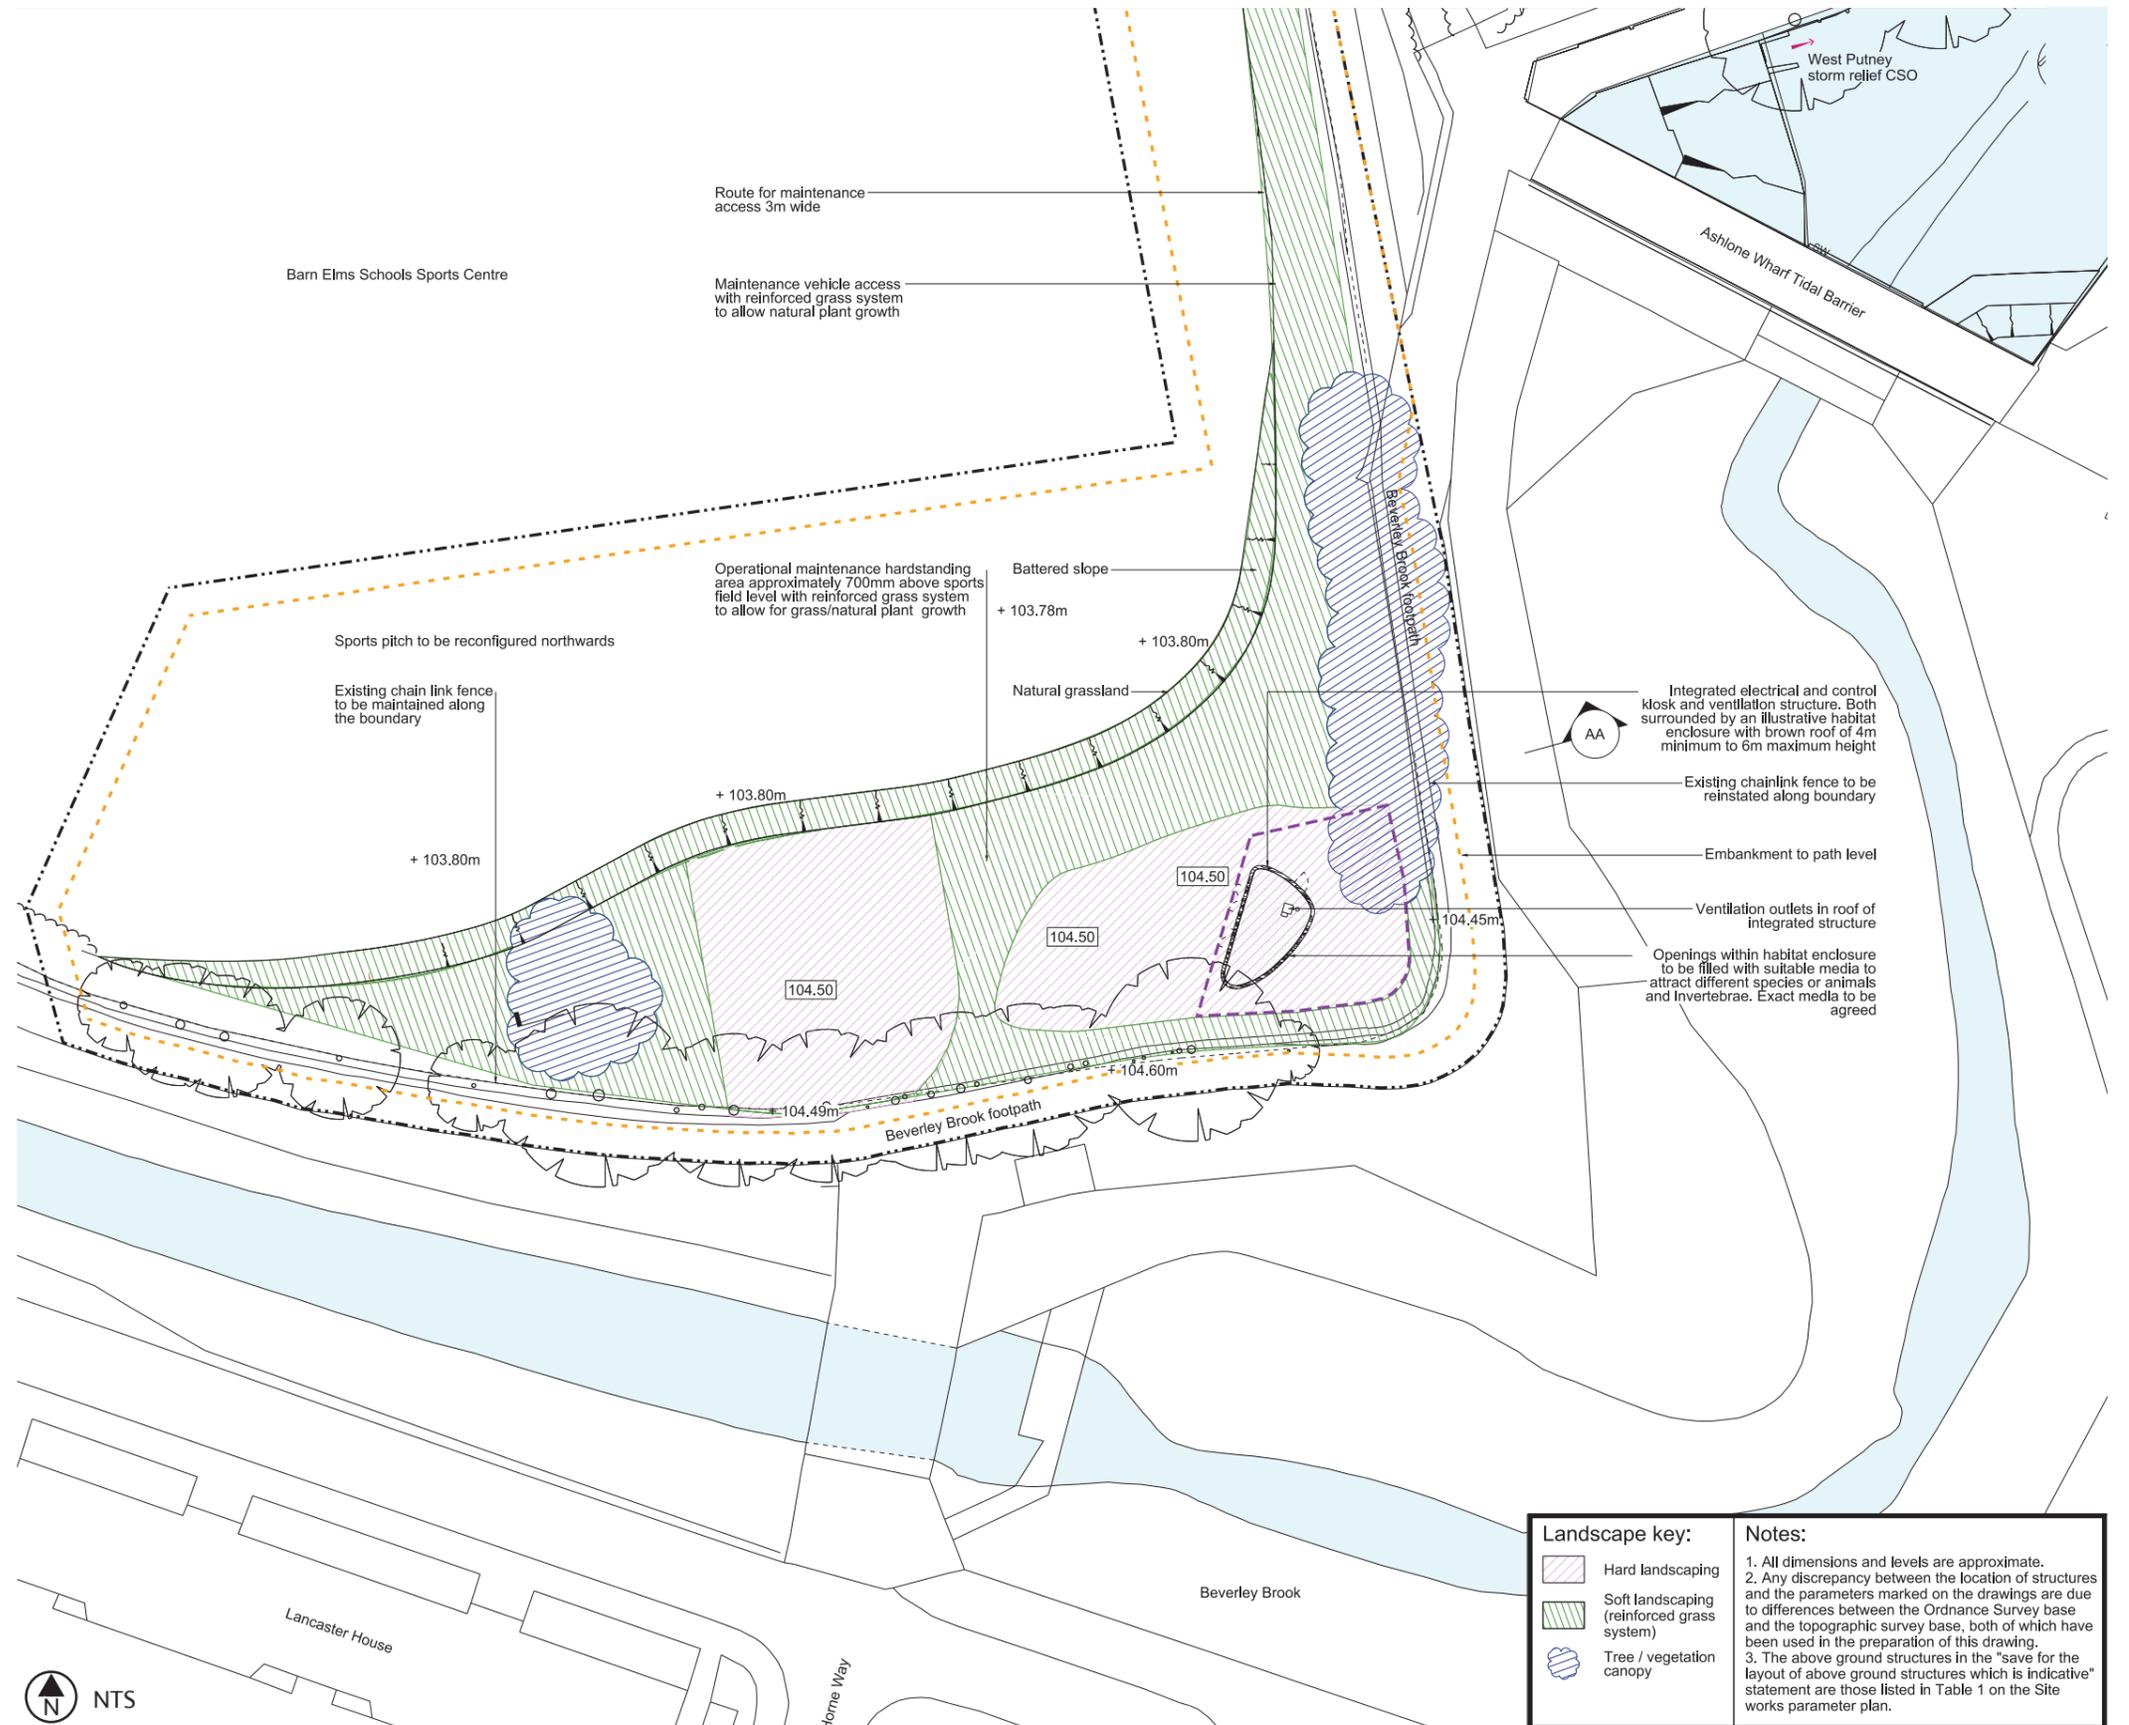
Proposed landscape plan - refer to Proposed landscape plan in the Book of Plans
